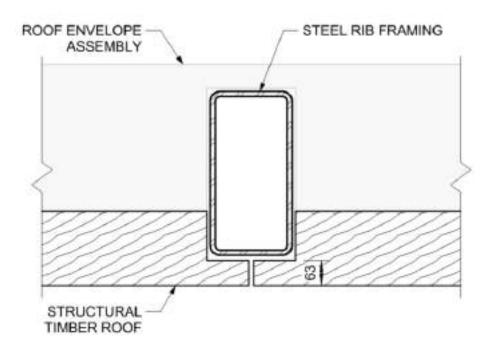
E: WEM Station Floating Timber Roof Deck
